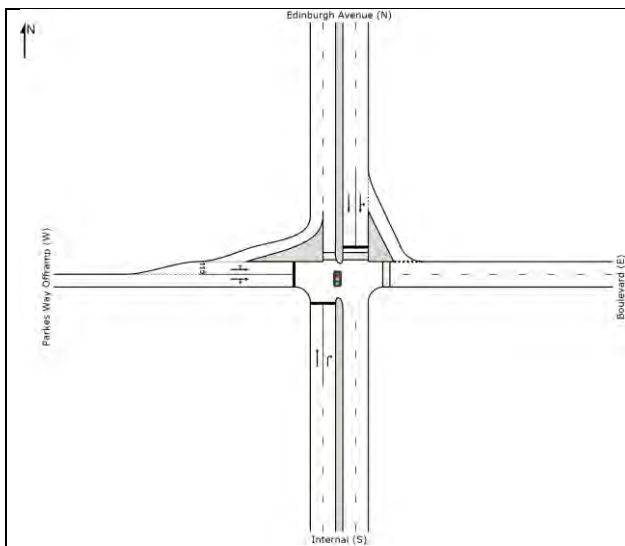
UDS Feasibility Design Parkes Way Boulevard – Edinburgh Avenue Intersection
